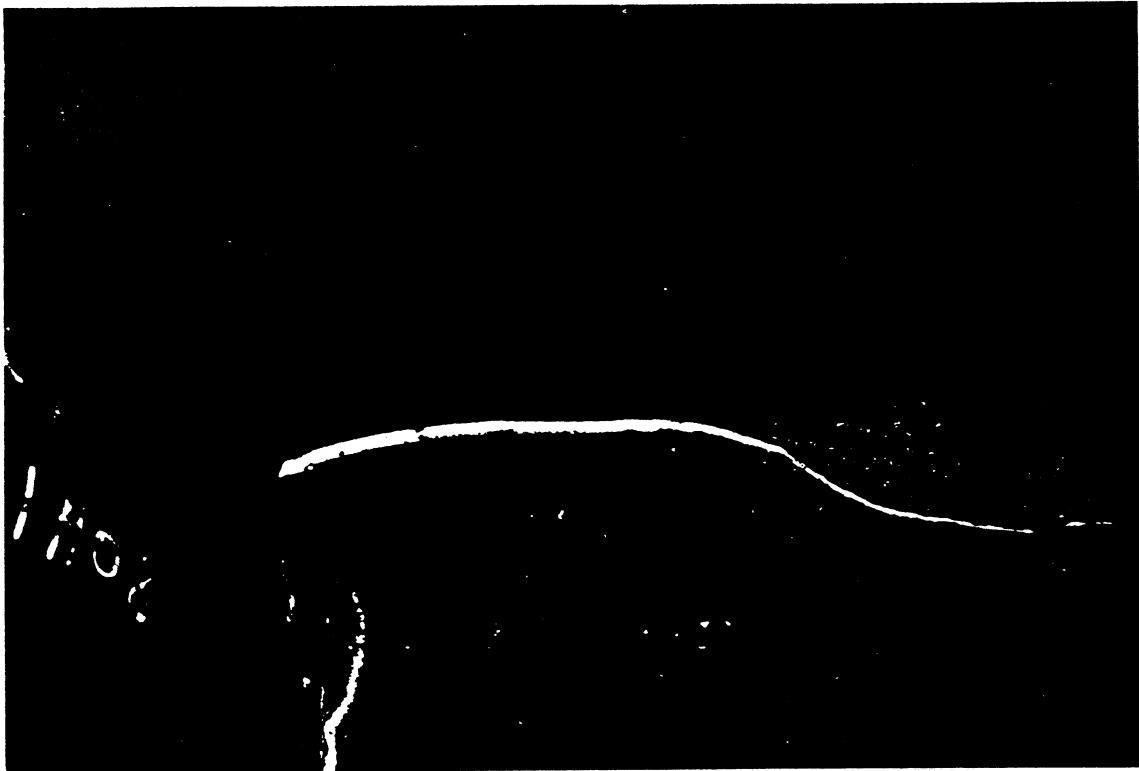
SPECIMEN 3 -- CRACK TRACE ON THE OUTER COLUMN SURFACE
